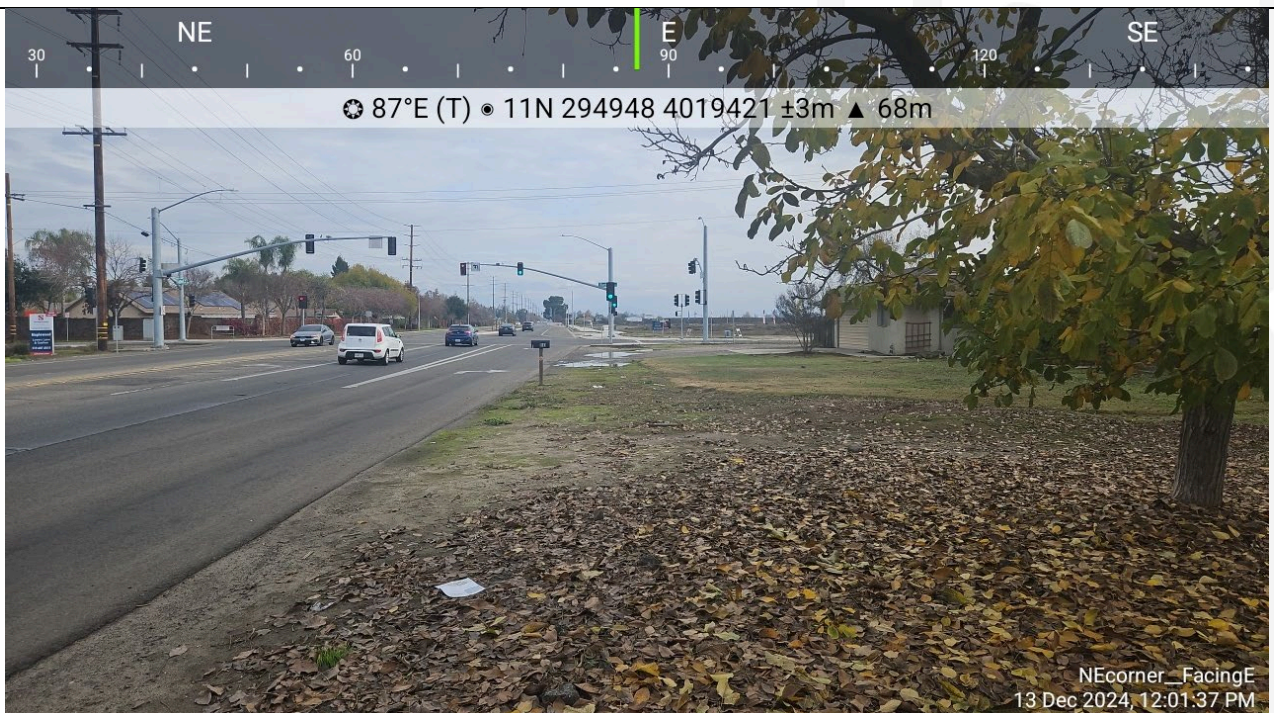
View of site conditions and residence on the northeast boundary of the project area facing east.
